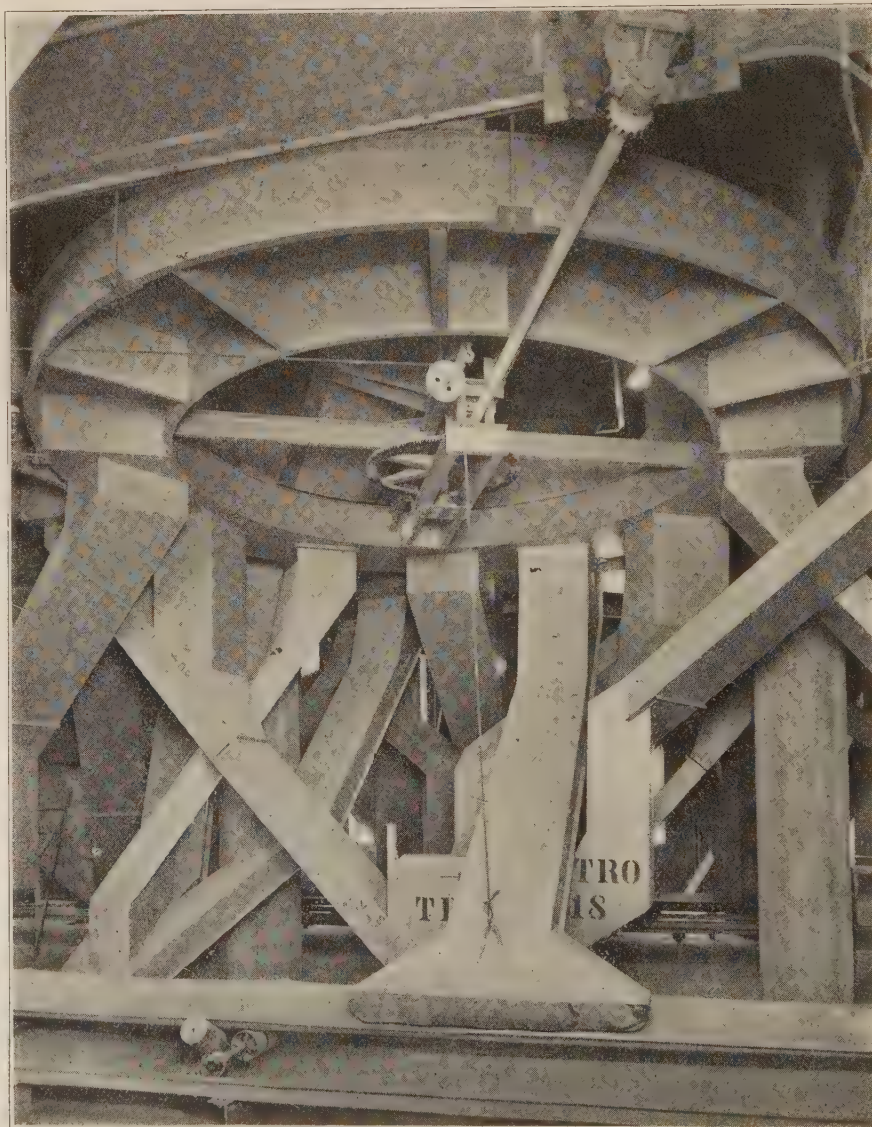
One of the Scale Turn Head Spouting Rings Beneath the Twenty-three Scale Hoppers on Transfer Floor of Working House Northern Central Elevator, Baltimore. Cut Shows Operating Mechanism for Turn Head and Fixed Spouting to Universal Spout, Transfer Conveyors and Shipping Bins.
